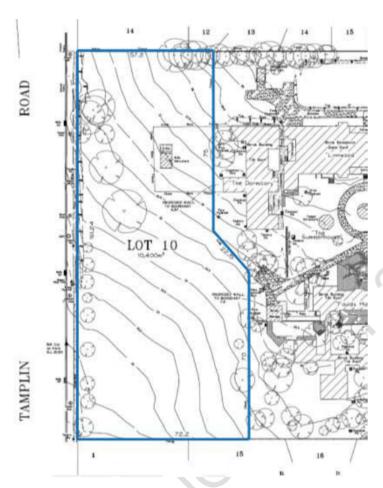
Lot 10, the proposed subdivided lot, outlined in blue
